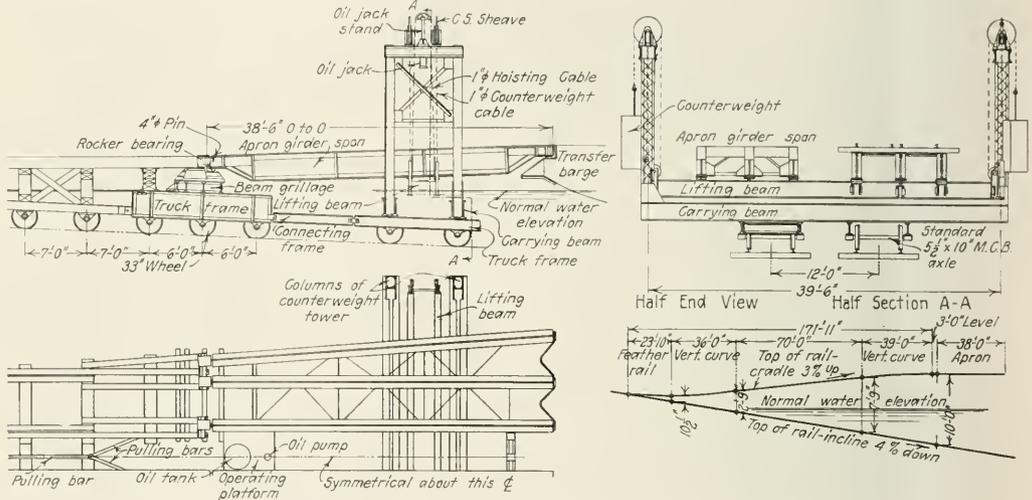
Half Plan, Elevation and Section of the Apron and Its Supports
